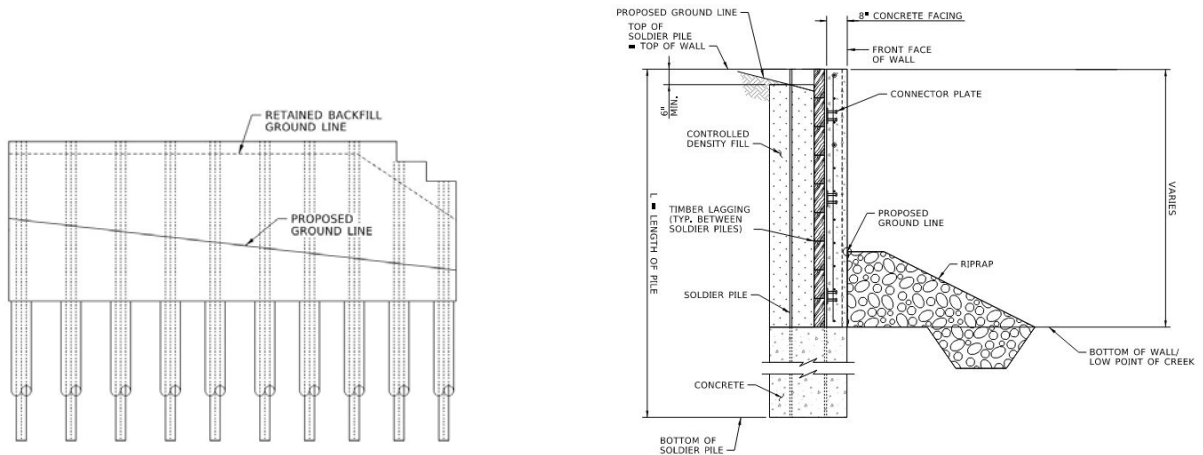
Example Soldier Pile Wall Elevation & Typical Section
